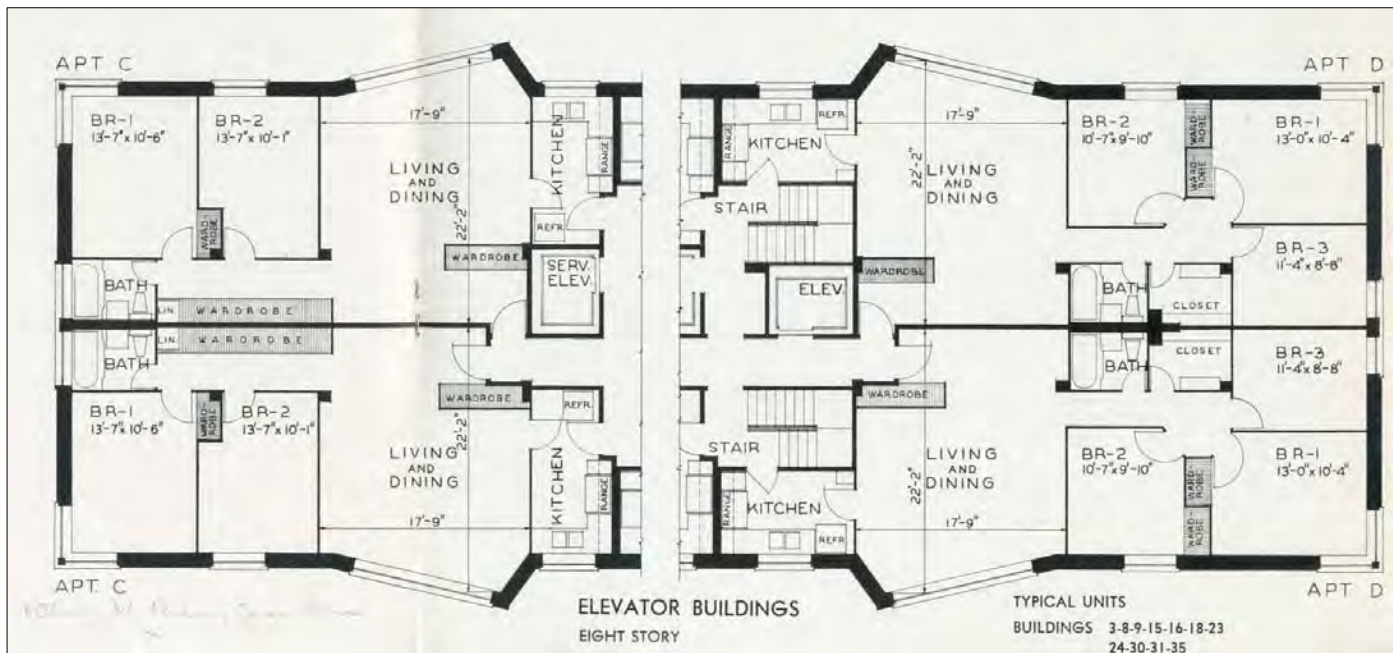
Floor plan of elevator buildings at Parkway Garden Homes.
